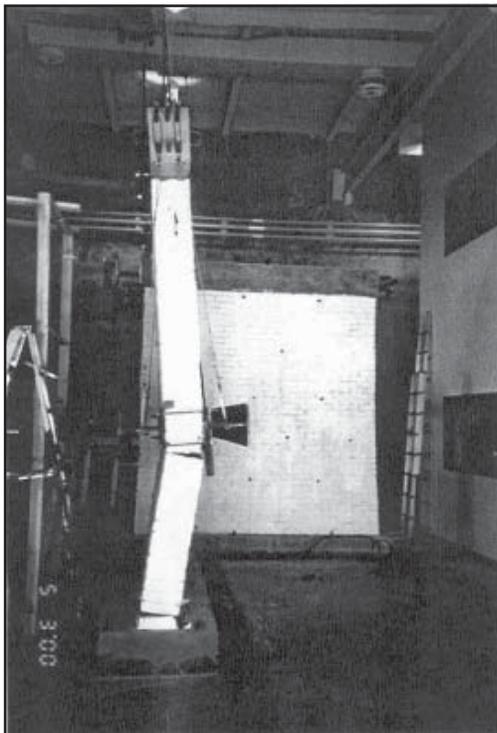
Failure of the Out-of-Plane Retrofitted Wall
